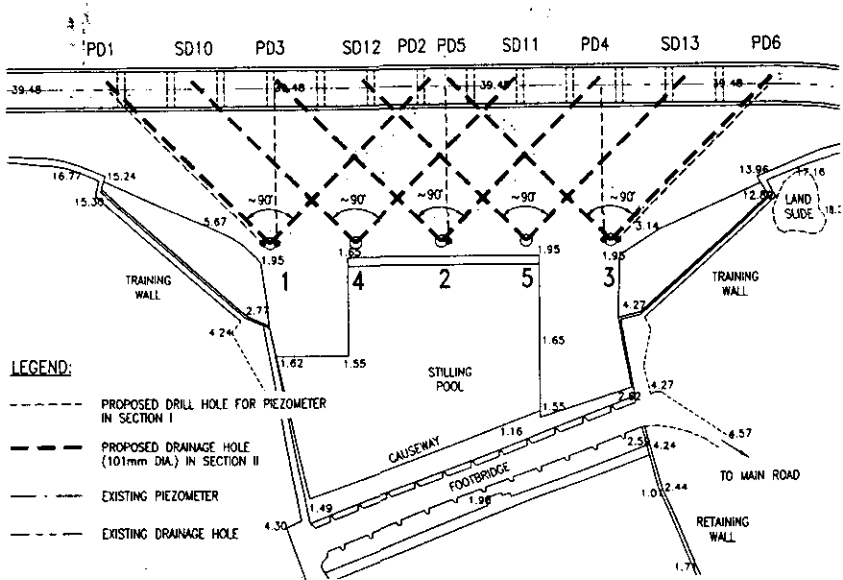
Plan showing maximum scope of drainage installation (Section II)
